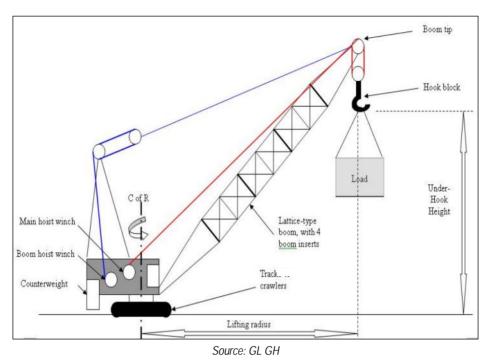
Crawler Crane, Showing Key Components and Dimension
